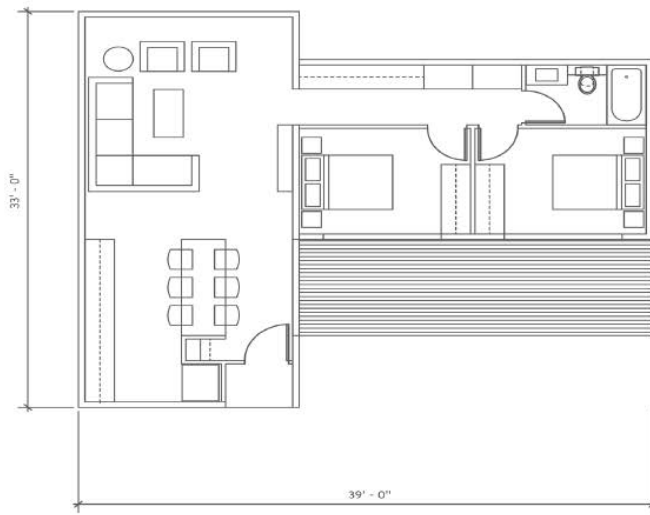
Site Plan of Design Schematic for The ParkerRaj Modern, (Parker, 2017).
